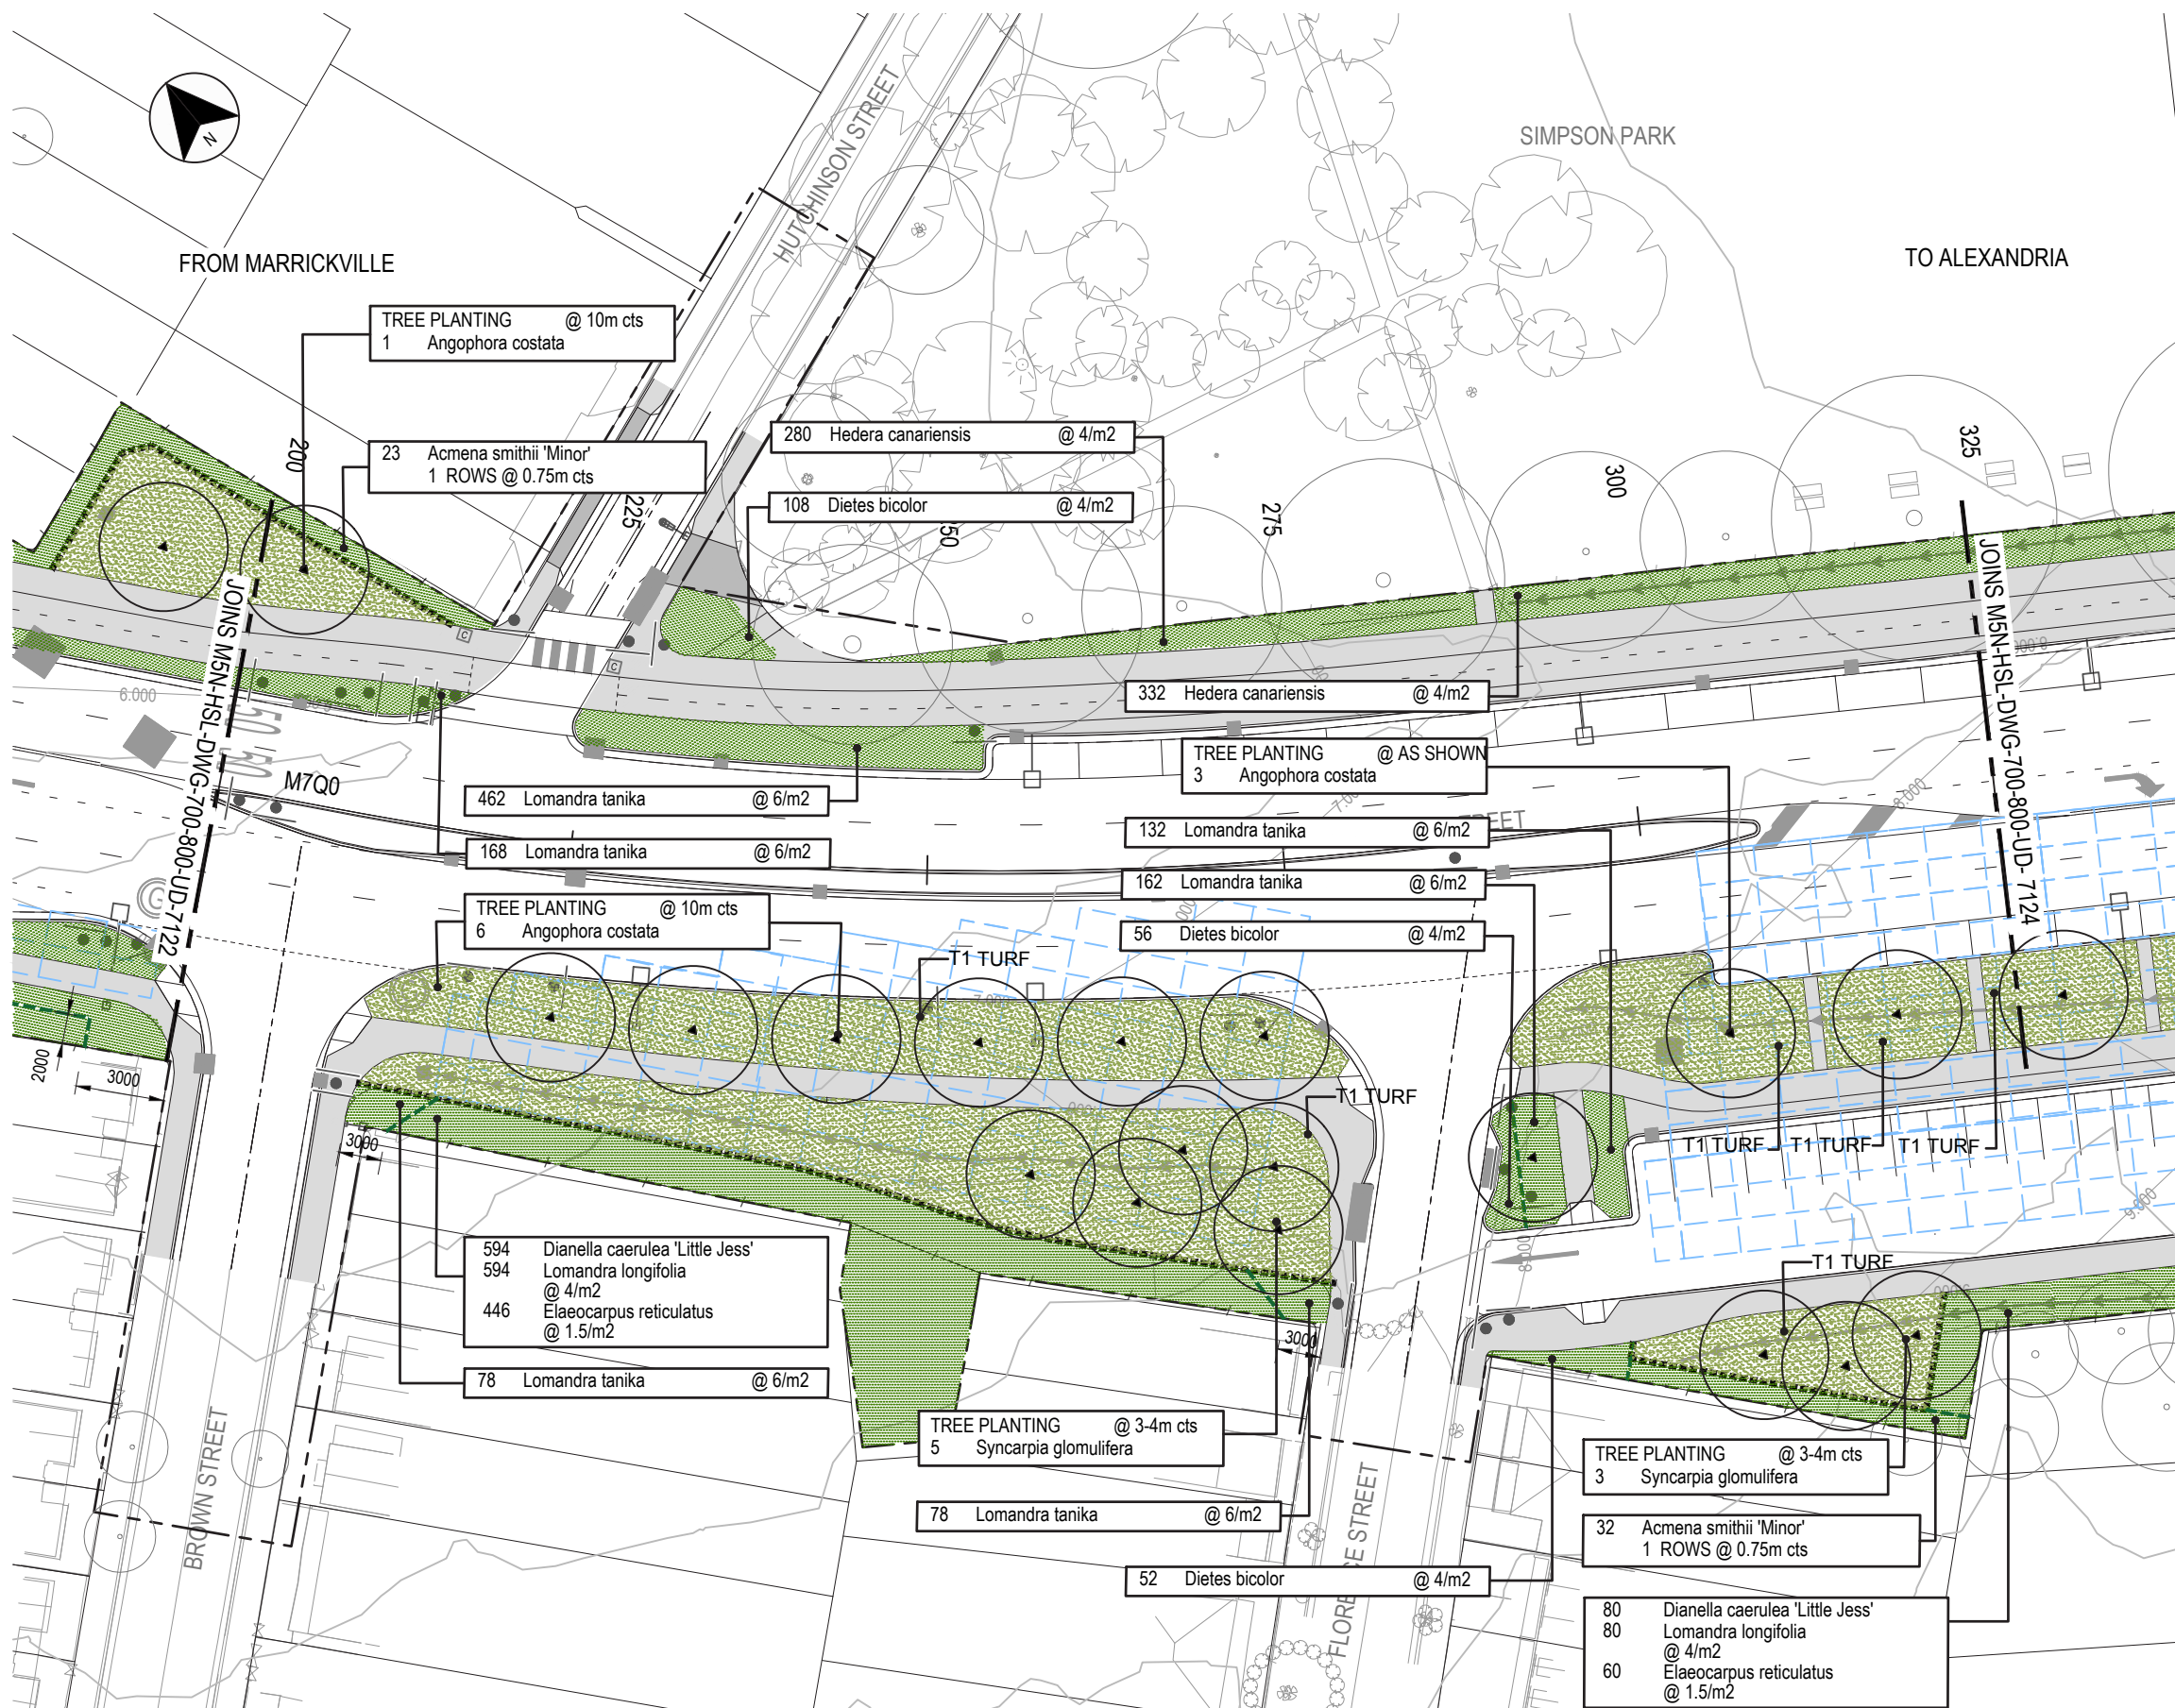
Campbell Street Green Link - Landscape Plans - Sheet 2 of 10
